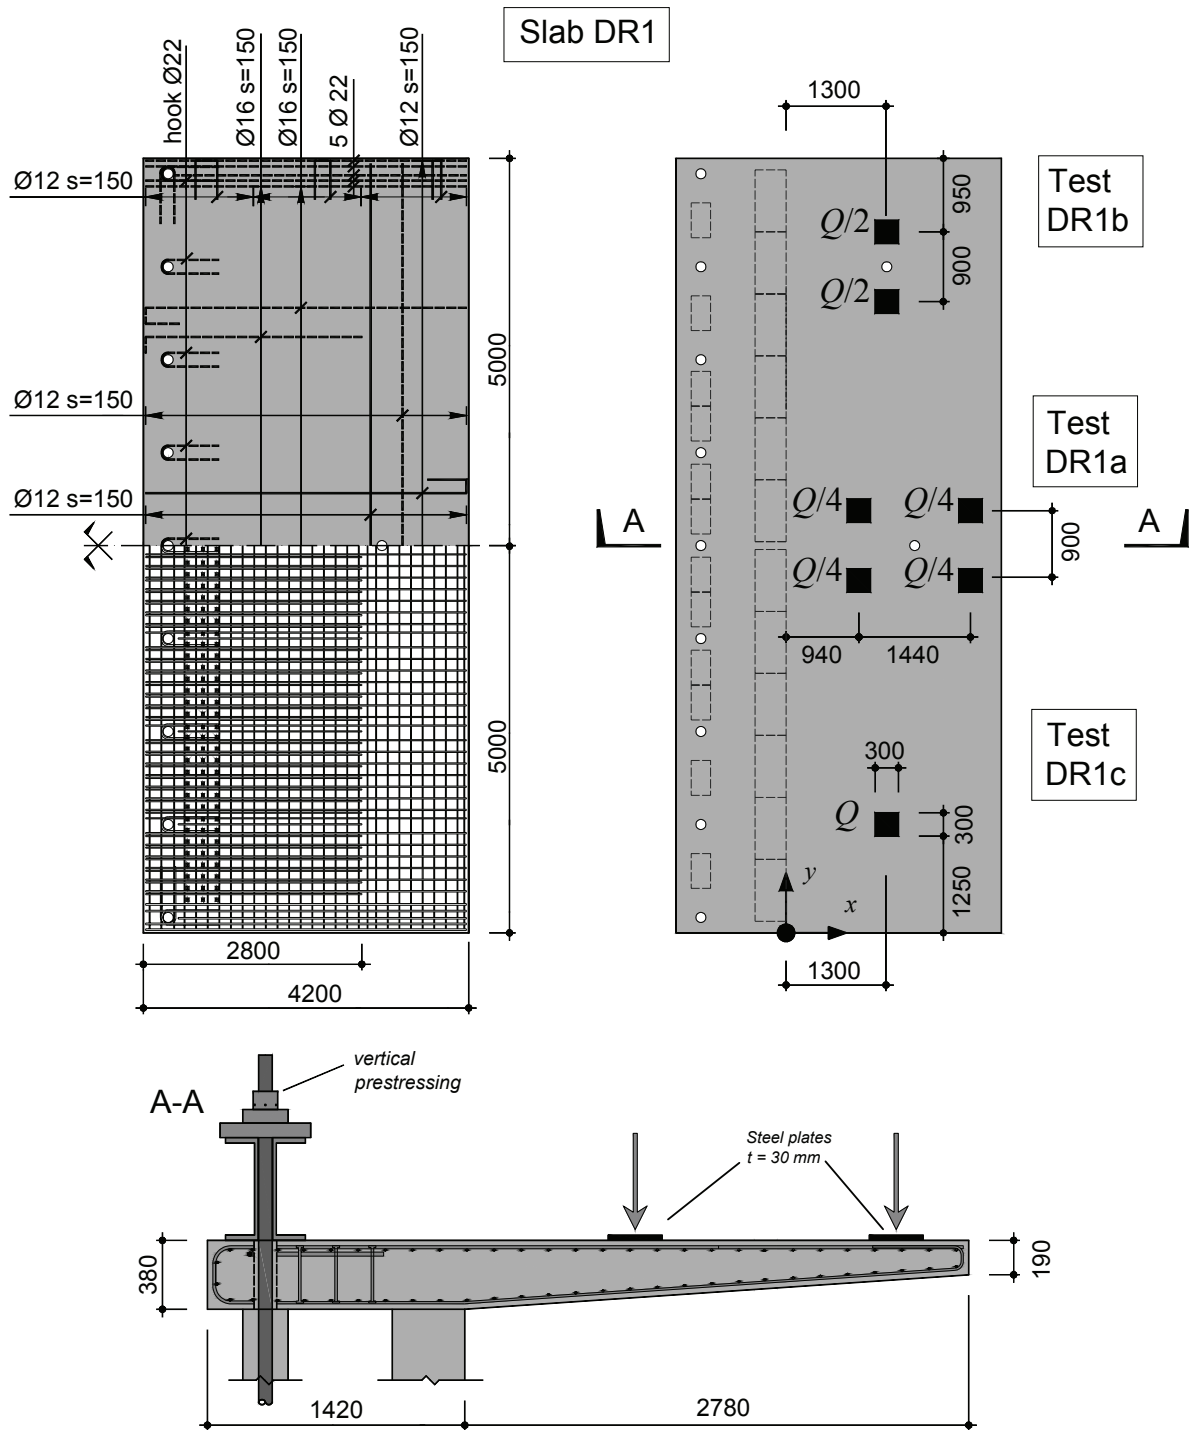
Slab DR1. Dimensions, reinforcement layout and applied loads [mm]
